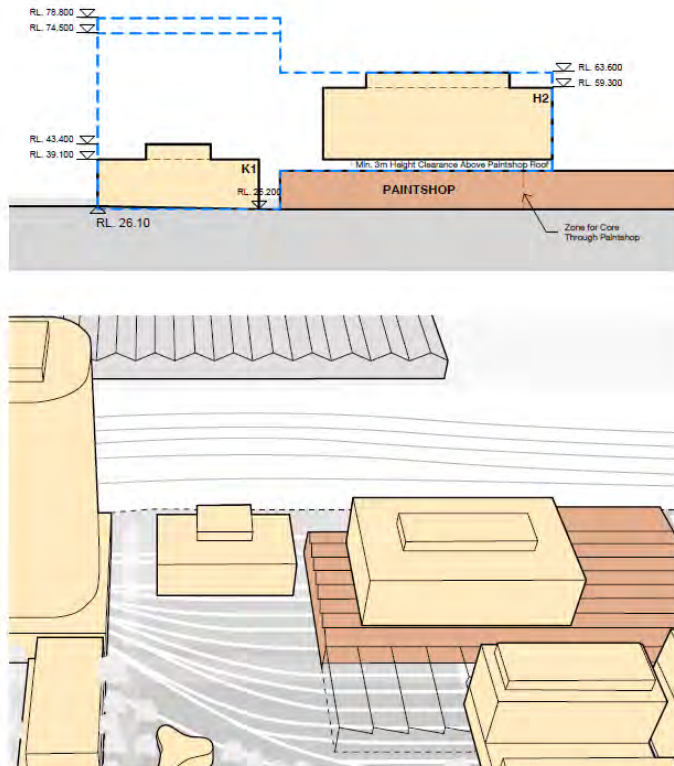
Building envelopes proposed for ‘Approach 1’ shows the overdevelopment structure supported above the existing sawtooth roof of the Paint Shop and generous setbacks from the Paint Shop Facades (Source: Bates Smart 2022;p126)
